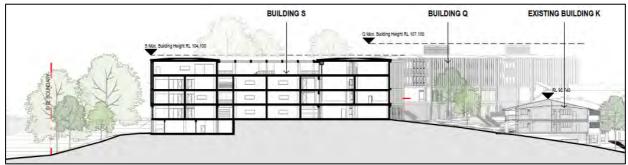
| CHS proposed west to east section, north facing (Source: EIS 2020)
